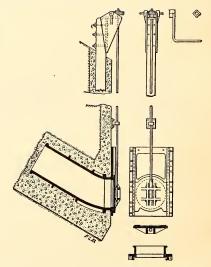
Outlet gate, Escondido Dam, Cal., adapted to concrete-lined reservoirs. (Redrawn, with modifications, from Schuyler's "Reservoirs for Irrigation," etc., p. 11.)
